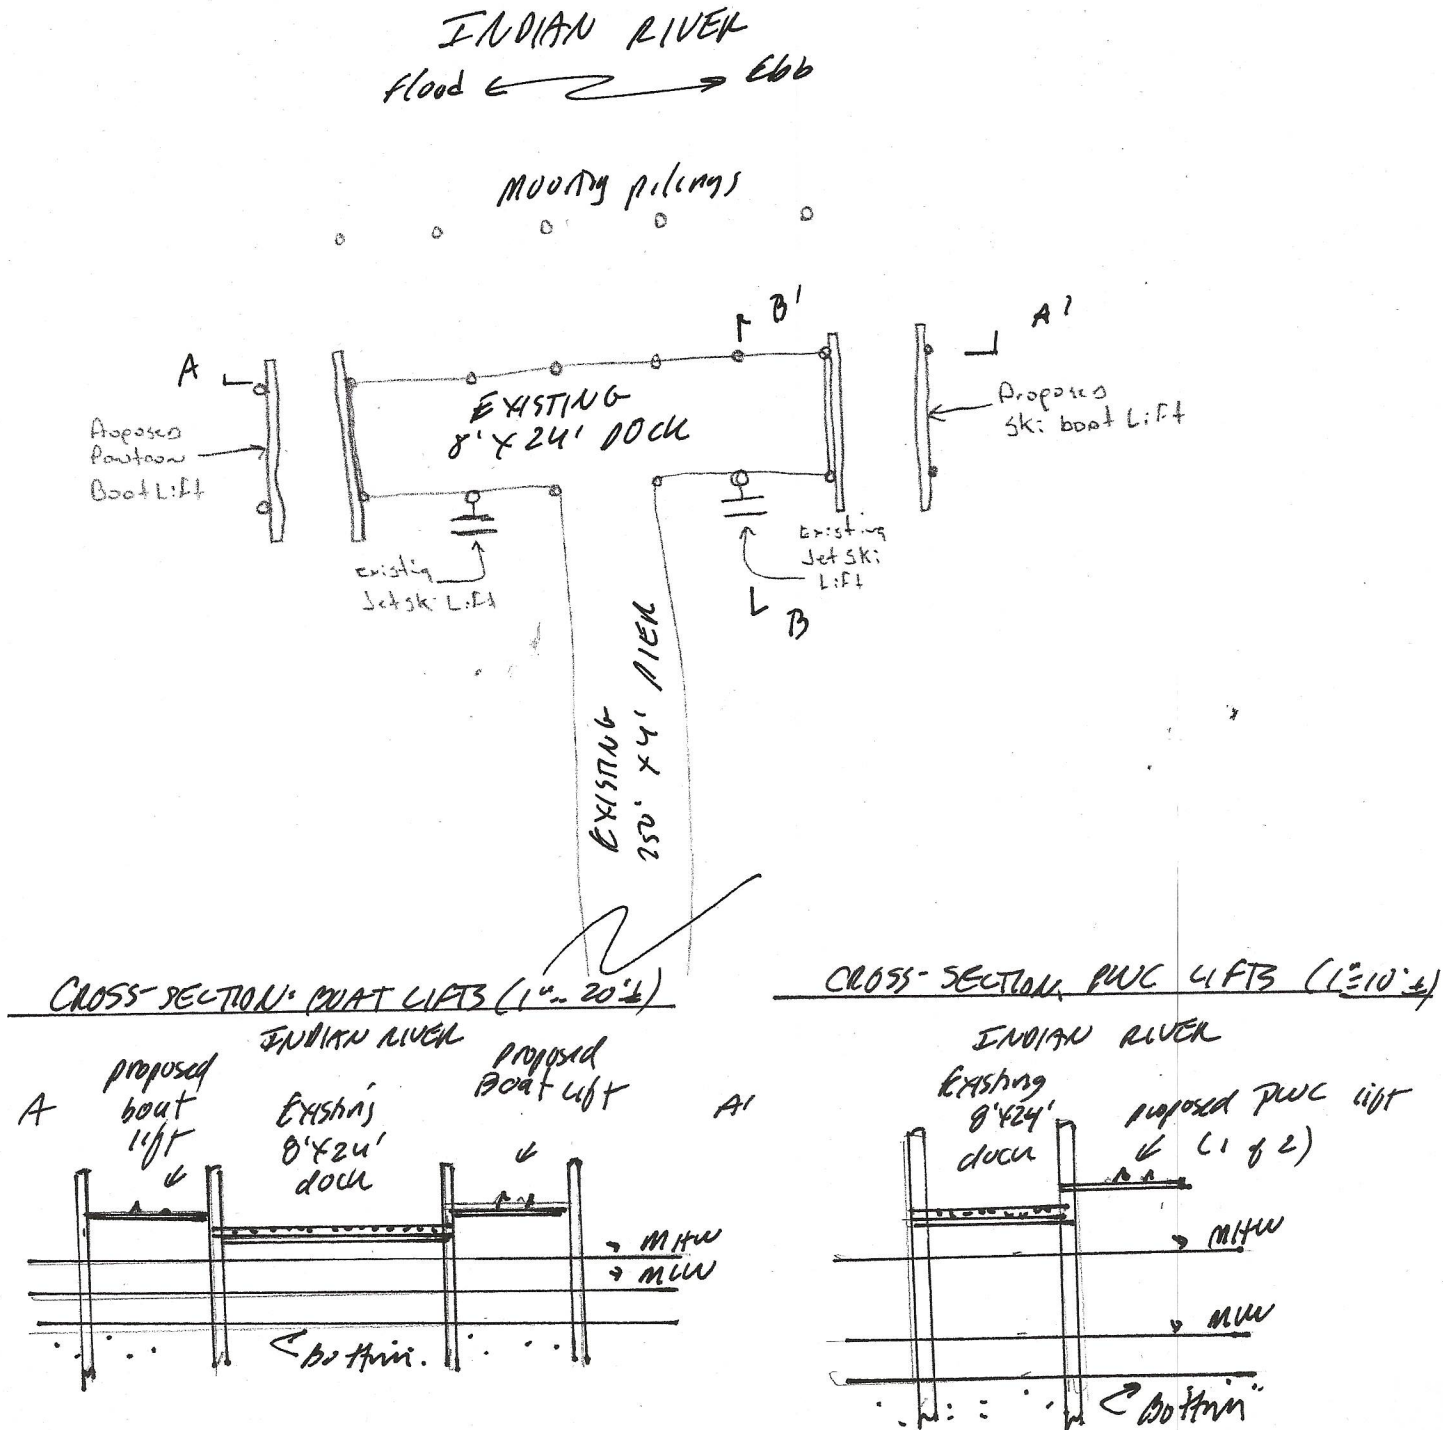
Plan view (prepared by applicant) and cross-section sketches of proposed project. Sketches for permit application purposes only.
